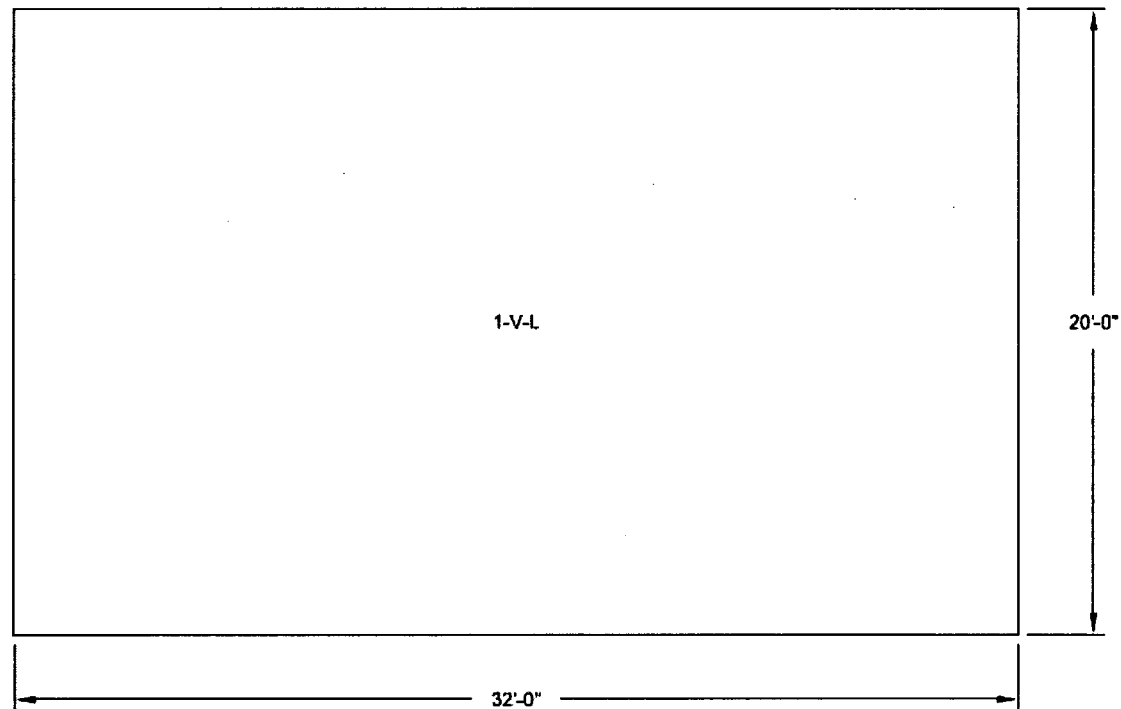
H.6-191 Wall 13 Looking From Outside
